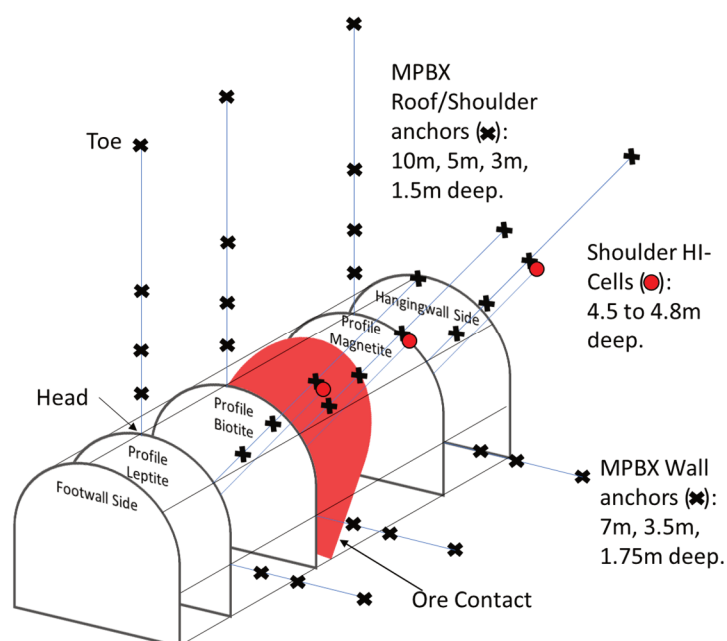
Layout of a typical fully instrumented site, including anchor positions and instrument lengths
